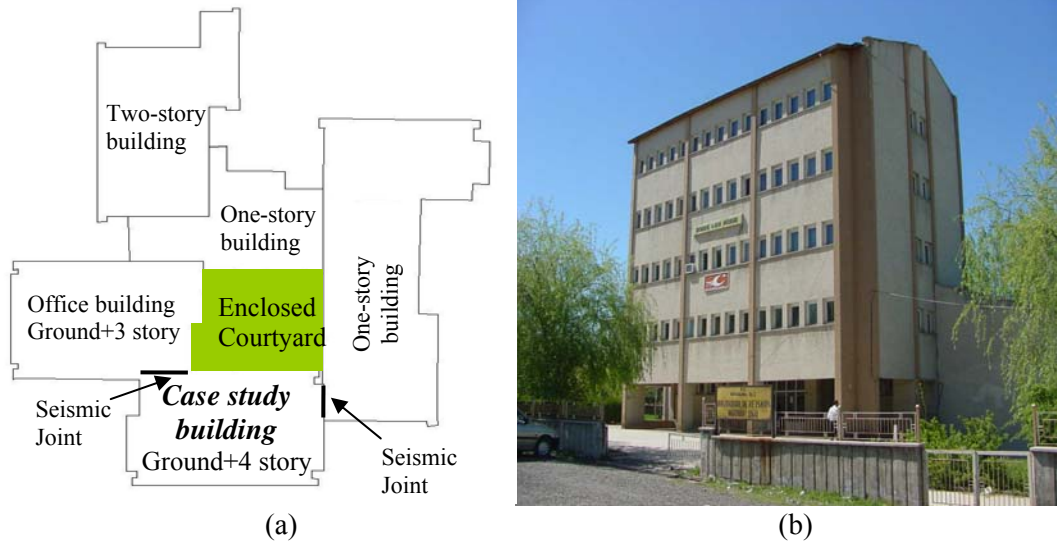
a) Plan of the building complex b) General view of the case study building
